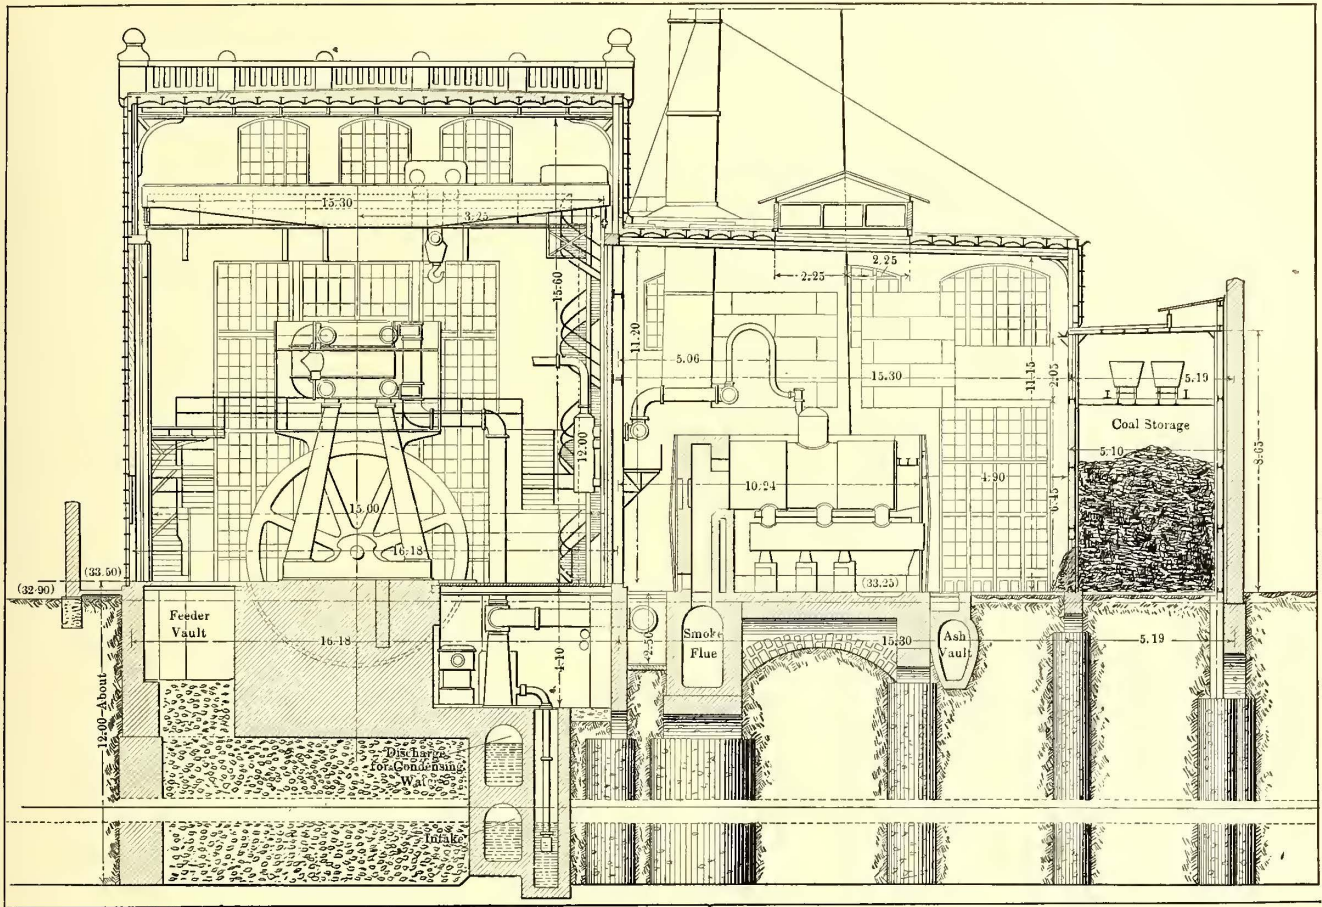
TRANSVERSE SECTION OF POWER HOUSE
